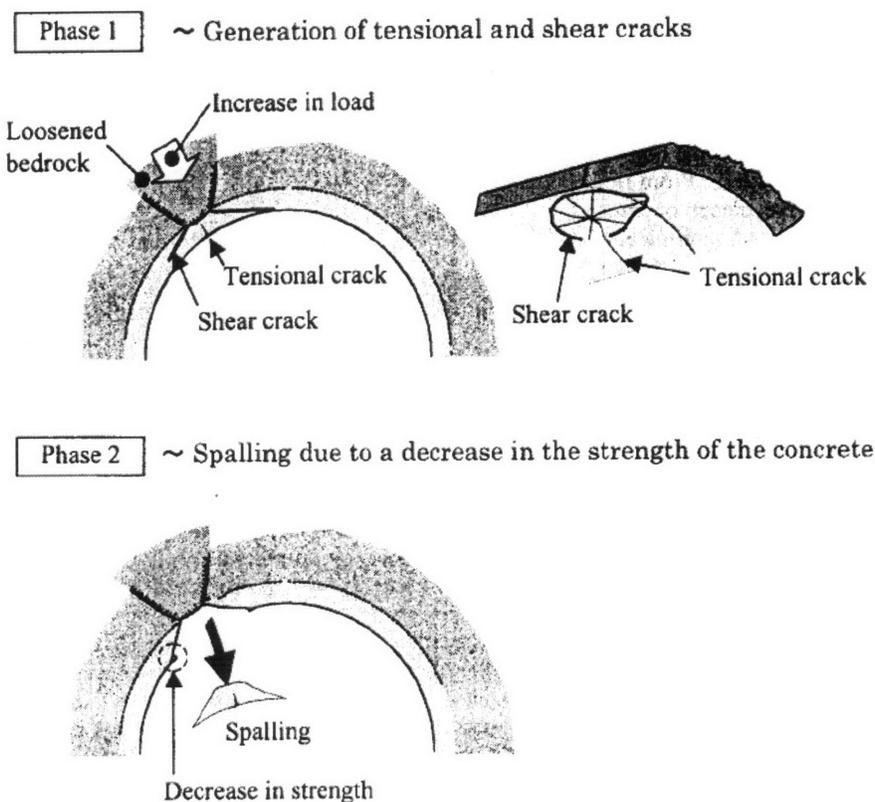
, Mechanism of Spalling in the Rebunhama Tunnel, (Asakura et al. 2001)
